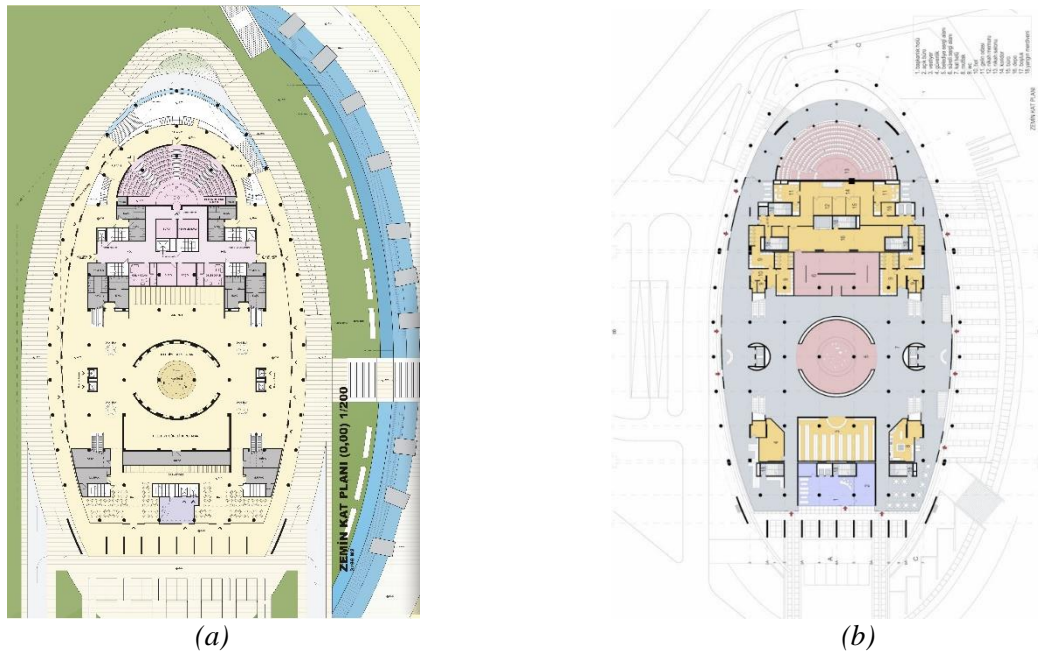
Ground floor plan of the concept design (a) and implementation project (b) [8]
